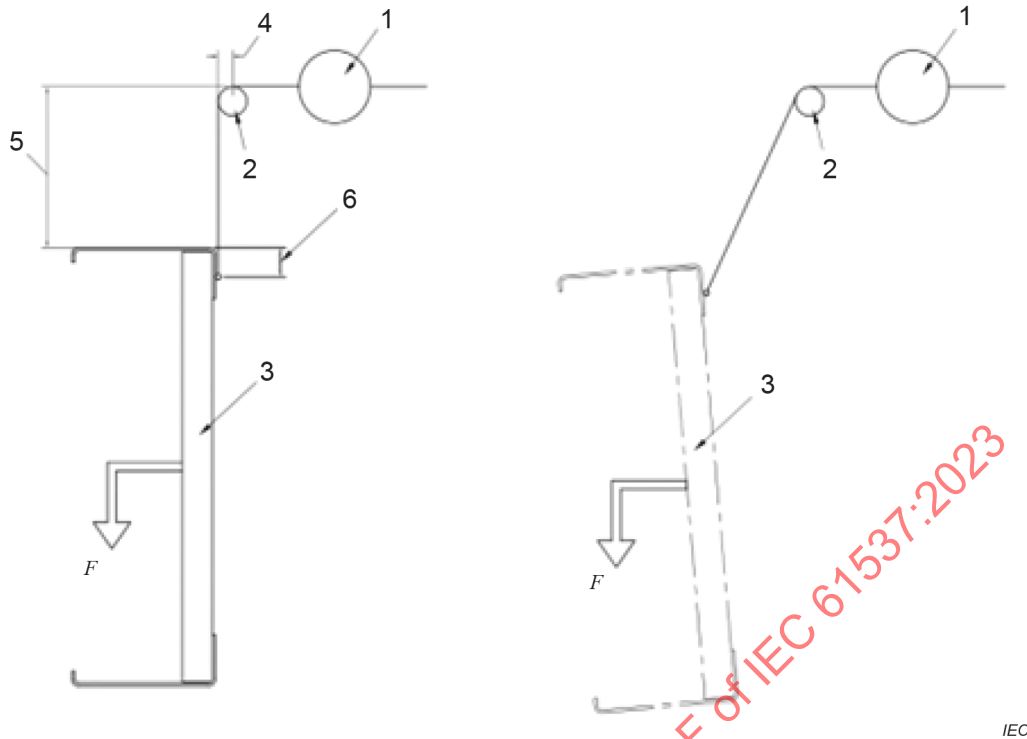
Test conditions: Single-span cable ladder mounted in the vertical plane running horizontally
